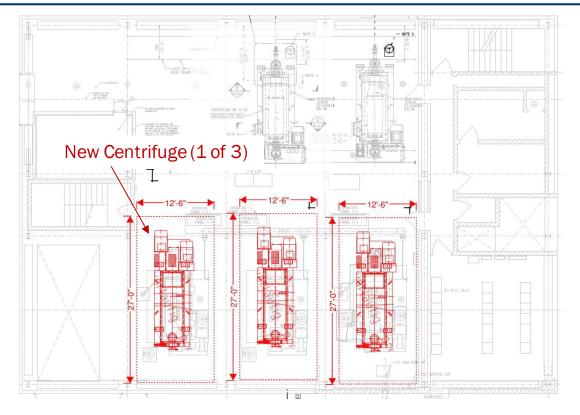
Floor plan for alternative to rehabilitate the existing Dewatering Building
